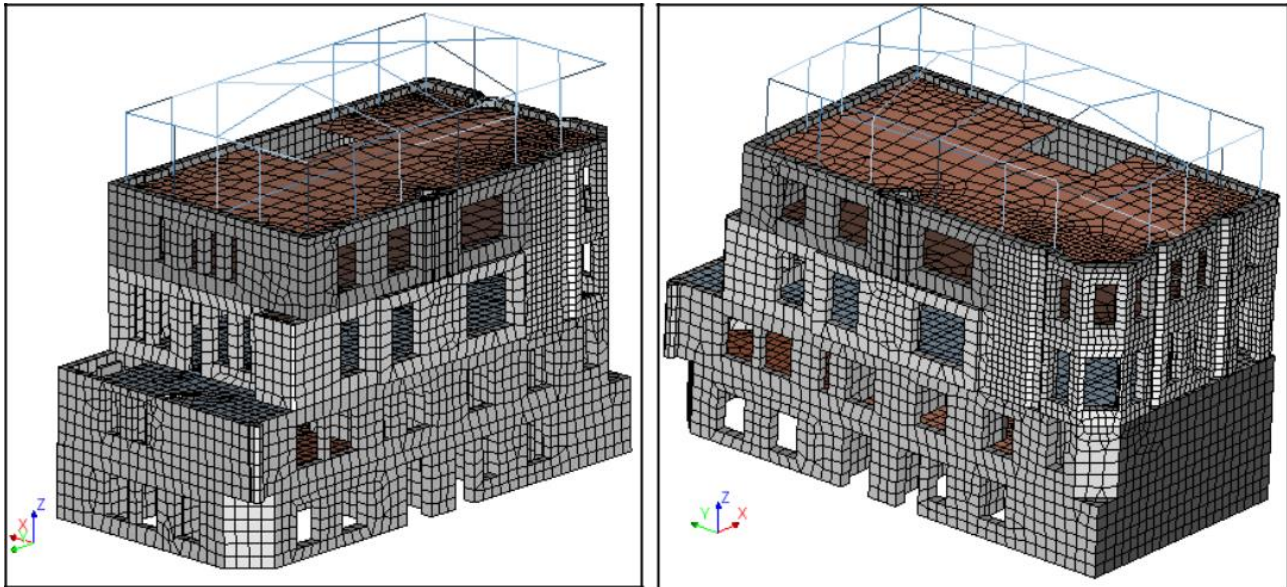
3D views of the finite element model; Left: View from Alley along the eastern side, Right: View from corner of The Terrace and Woodward Street
